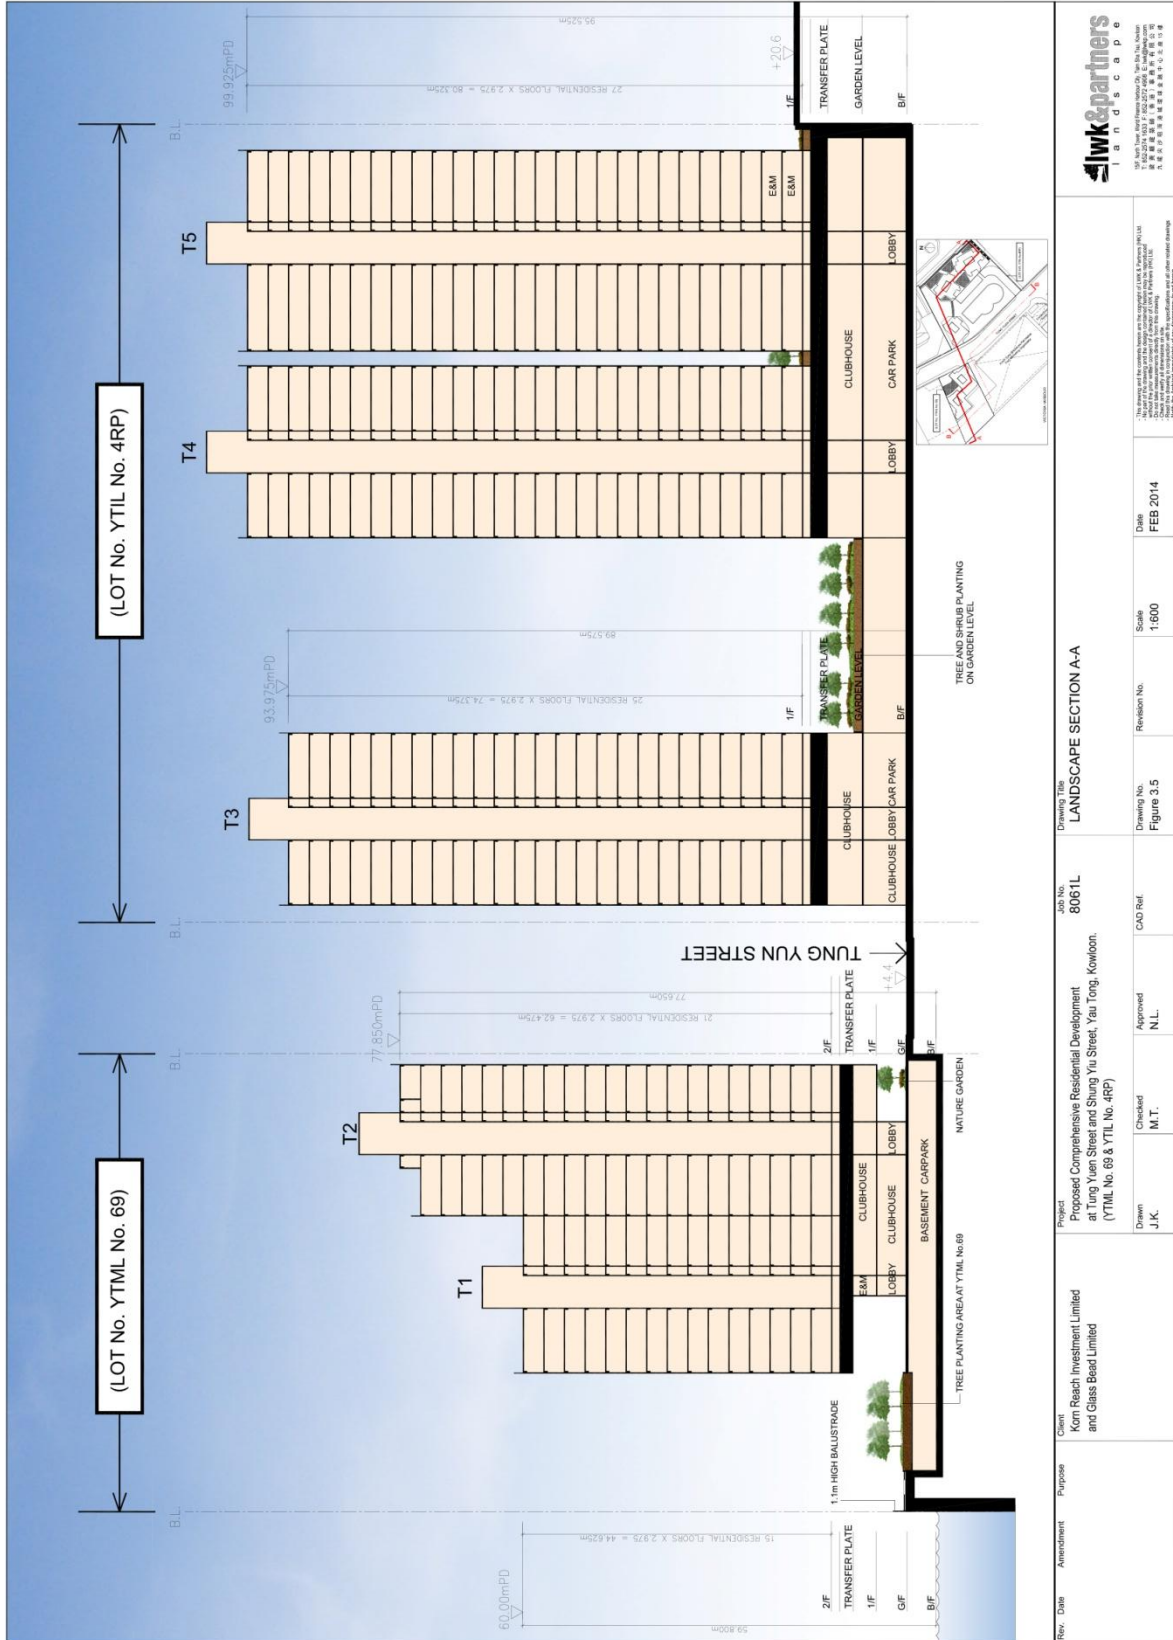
Section Plan Showing the Stepped Height Profile and Visual Corridor of the Proposed Scheme
